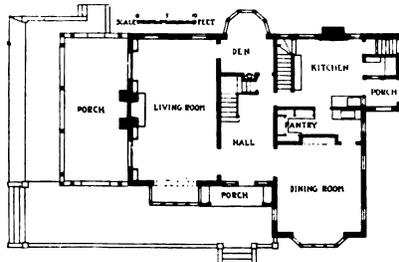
Plan showing projection of dining room wing. Floor area 1,385 square feet, exclusive of porches
